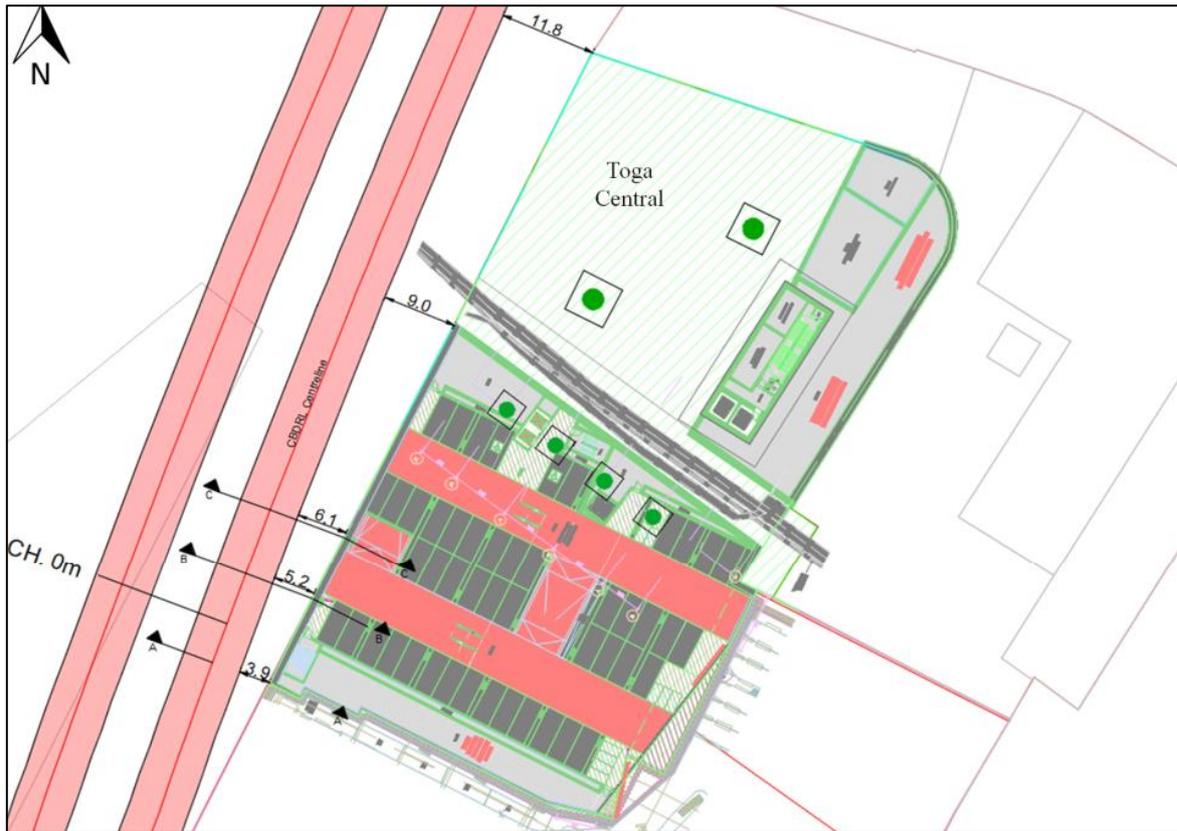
Plan view illustrating horizontal distances from the CBDRL tunnels to proposed development (source: project rail interface report [2])
